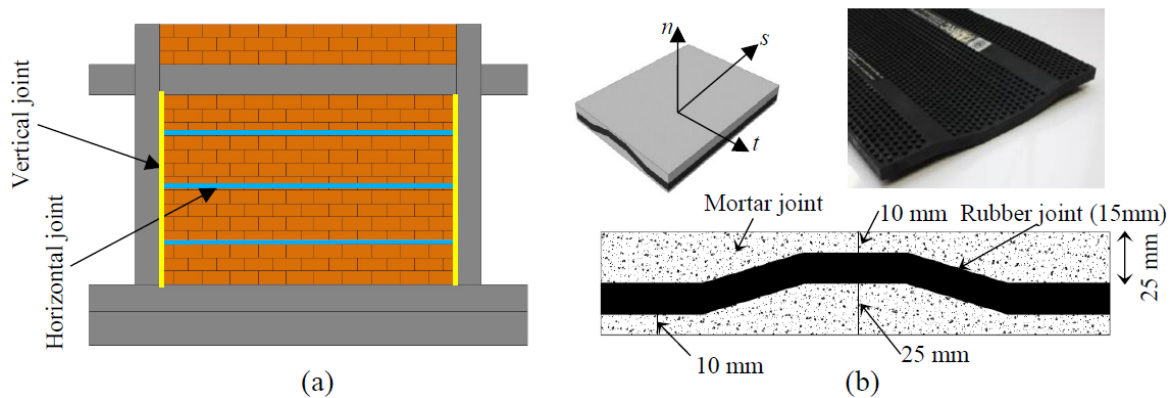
(a) Masonry infilled frame with rubber joints (b) HDNR joint developed by TARRC.
